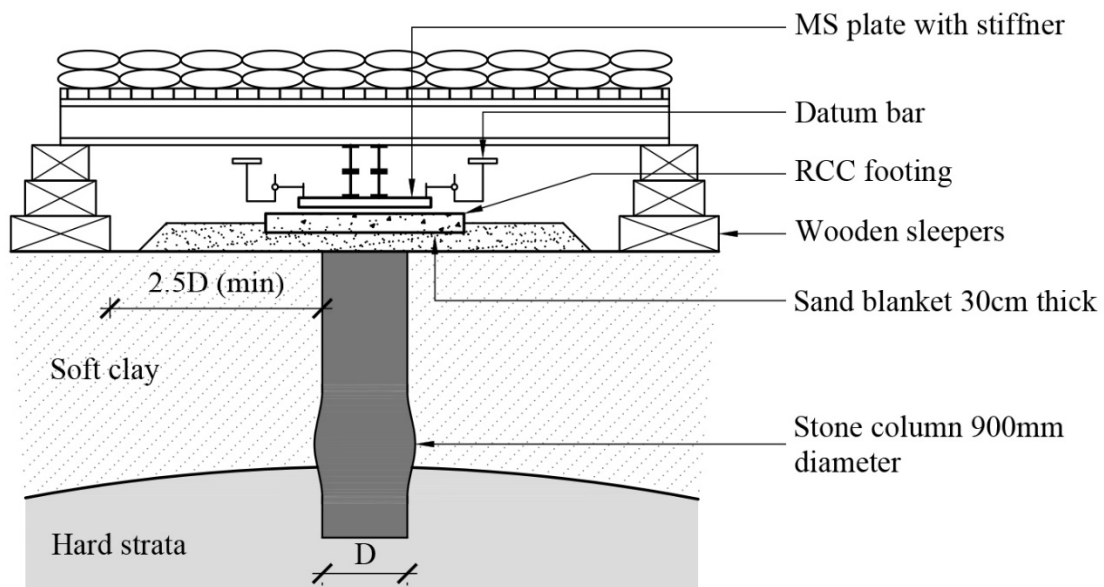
Typical test set-up for a single column (adapted from Maurya, Sharma & Naresh, 2005)
